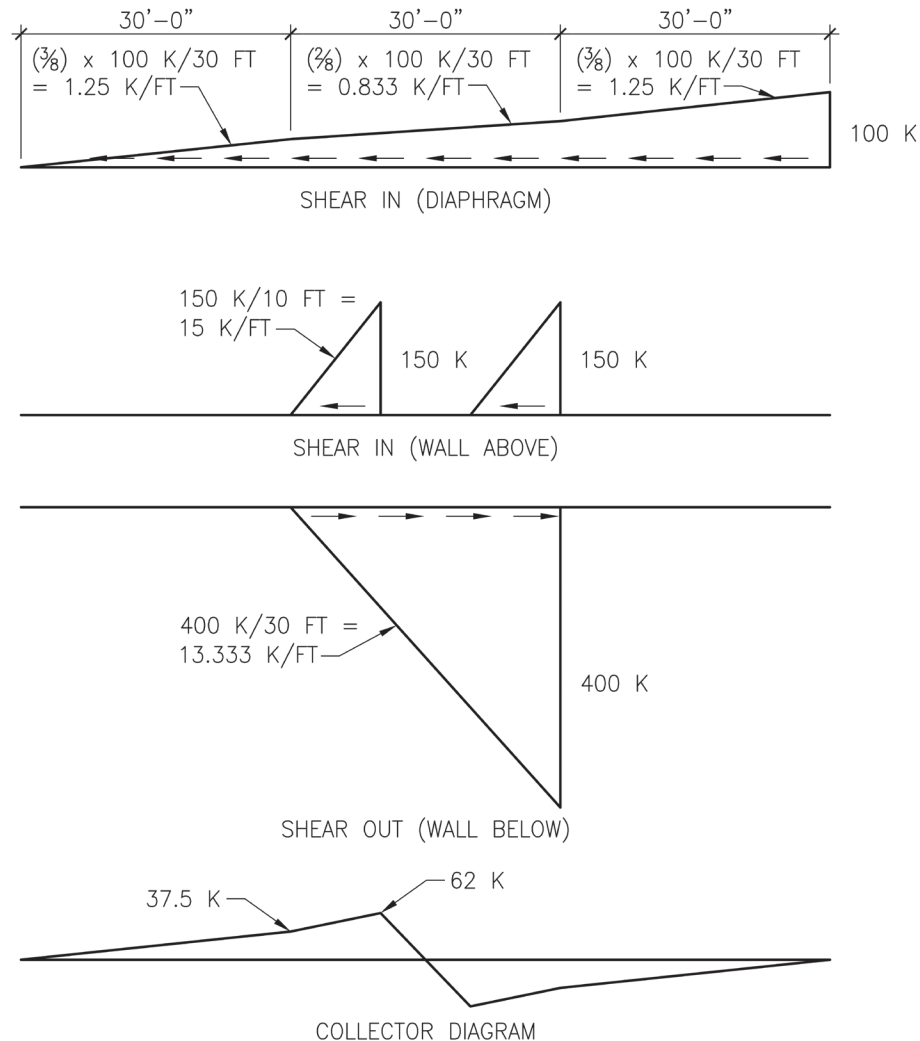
Collector Diagrams Incorporating Tributary Mass and Wall Opening
